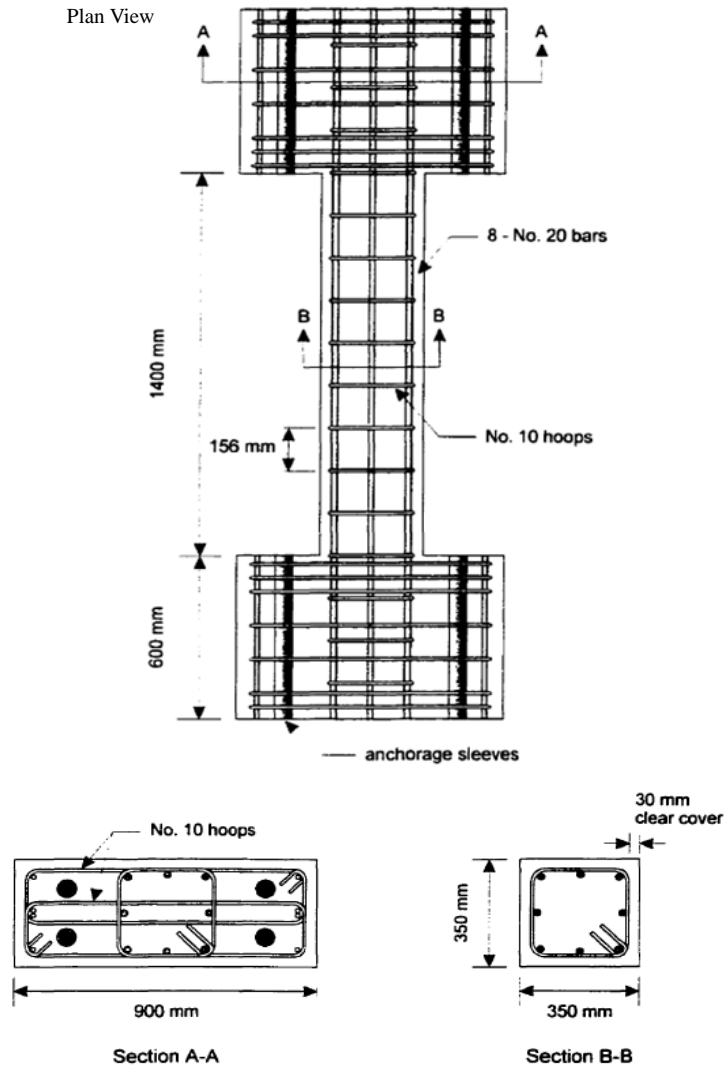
Bristowe (2000) Specimen N1 and H1 Reinforcing Details (adopted from Bristowe 2000)
